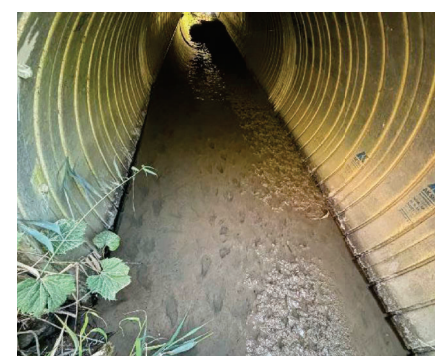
Animal tracks present in bottom of east barrel of concrete pipe culvert at Crossing 6 (facing south).
